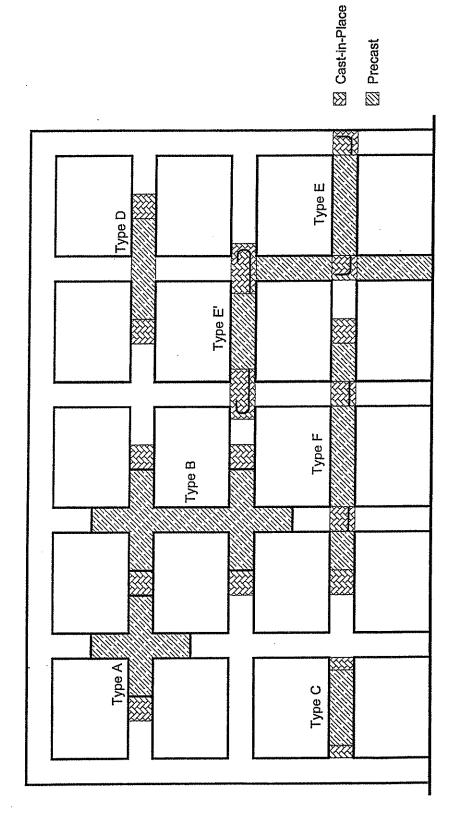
Various Precast Units in Japanes e Frame Systems (Adapted from Ref. [1-22])
